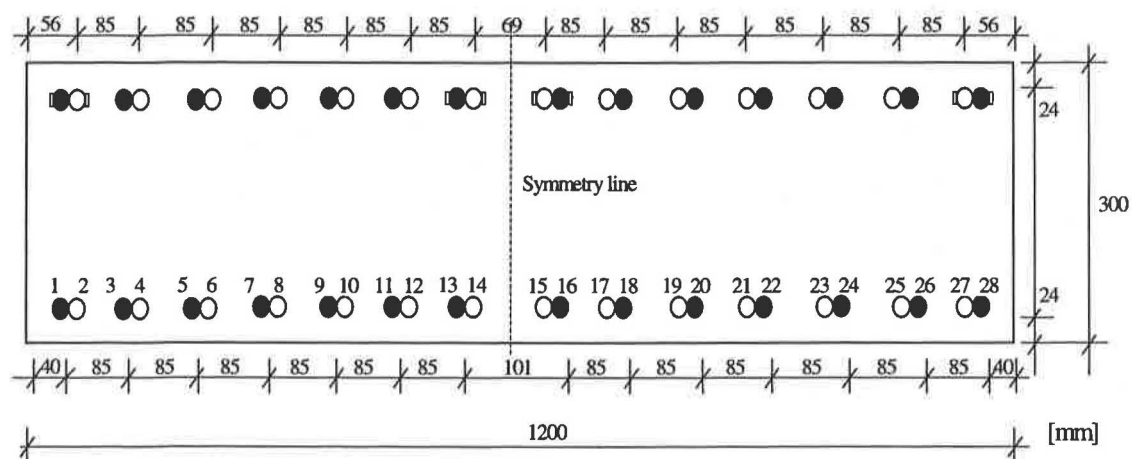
Reinforcement detailing of specimen RV14 (transverse section A-A).
